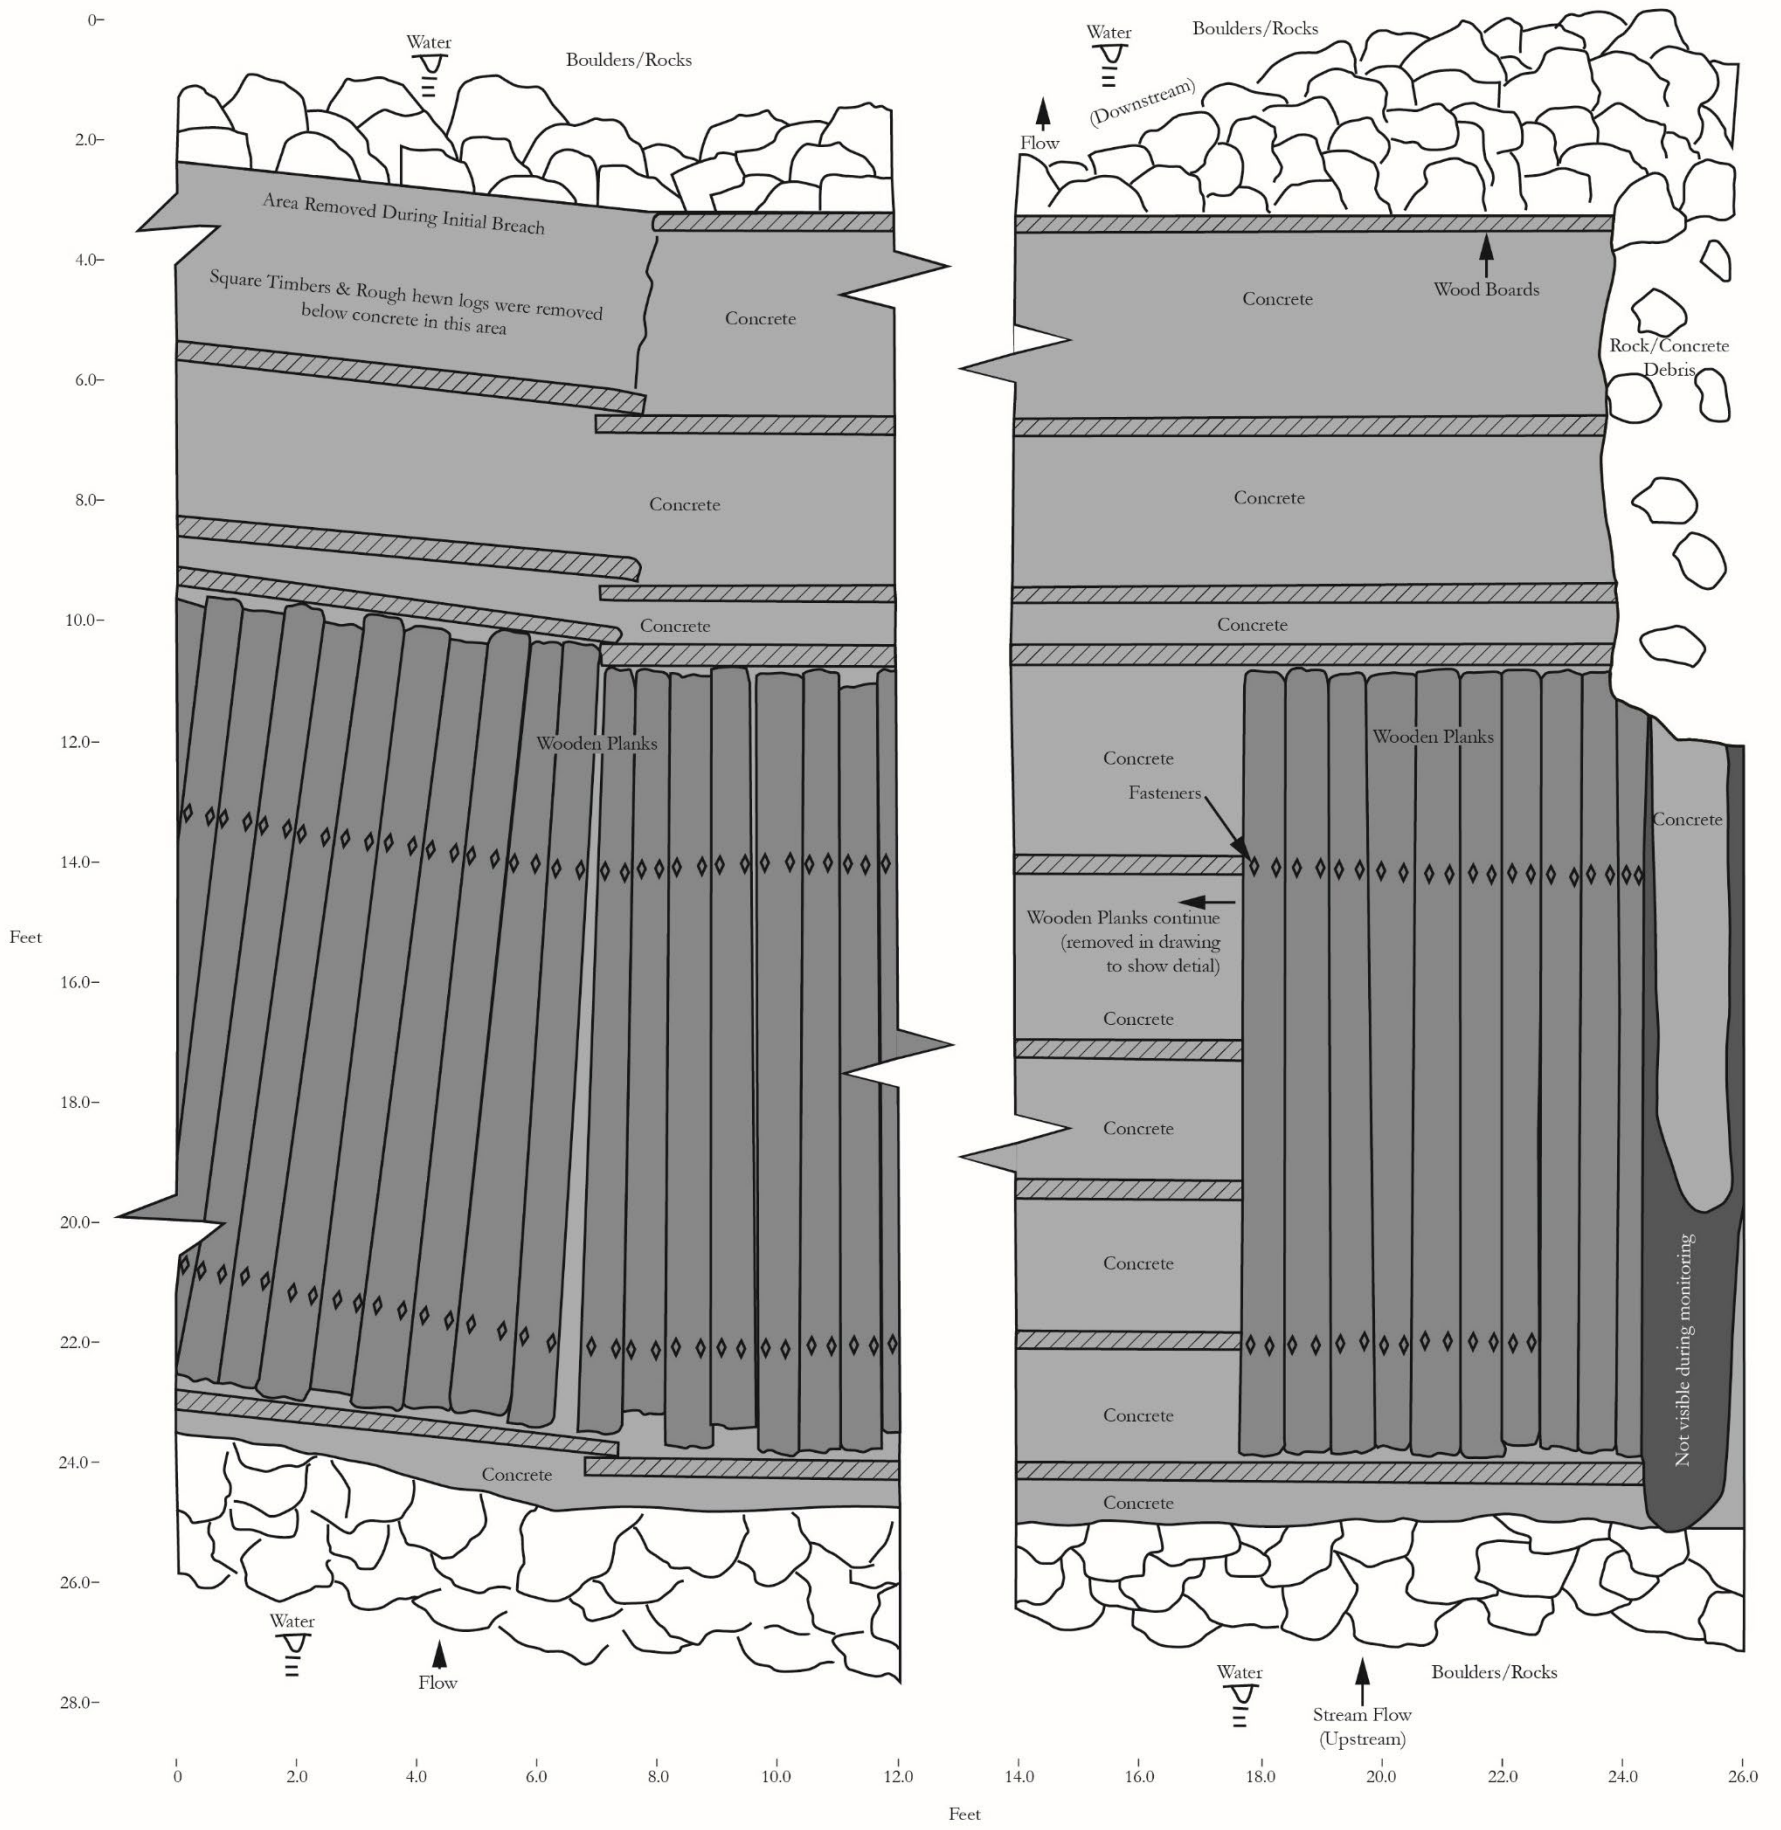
Representative plan view of Brandywine Dam 6/Lower Hagley Yard Mill Dam near its southern abutment.
